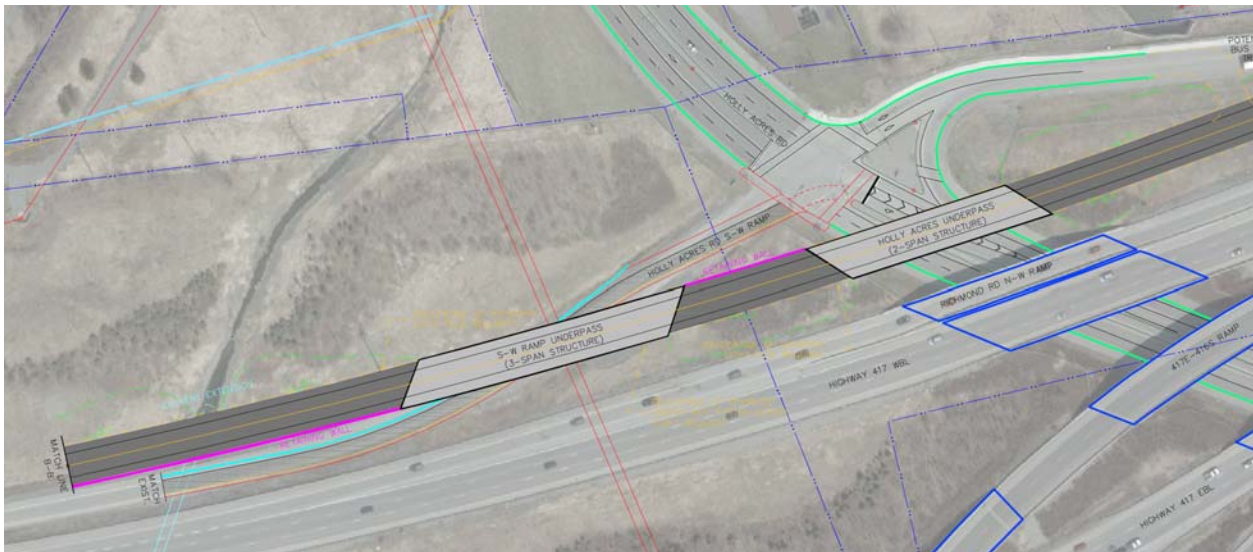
Alternative A1 - Under Holly Acres Maintaining Existing Highway Ramp Alignment
